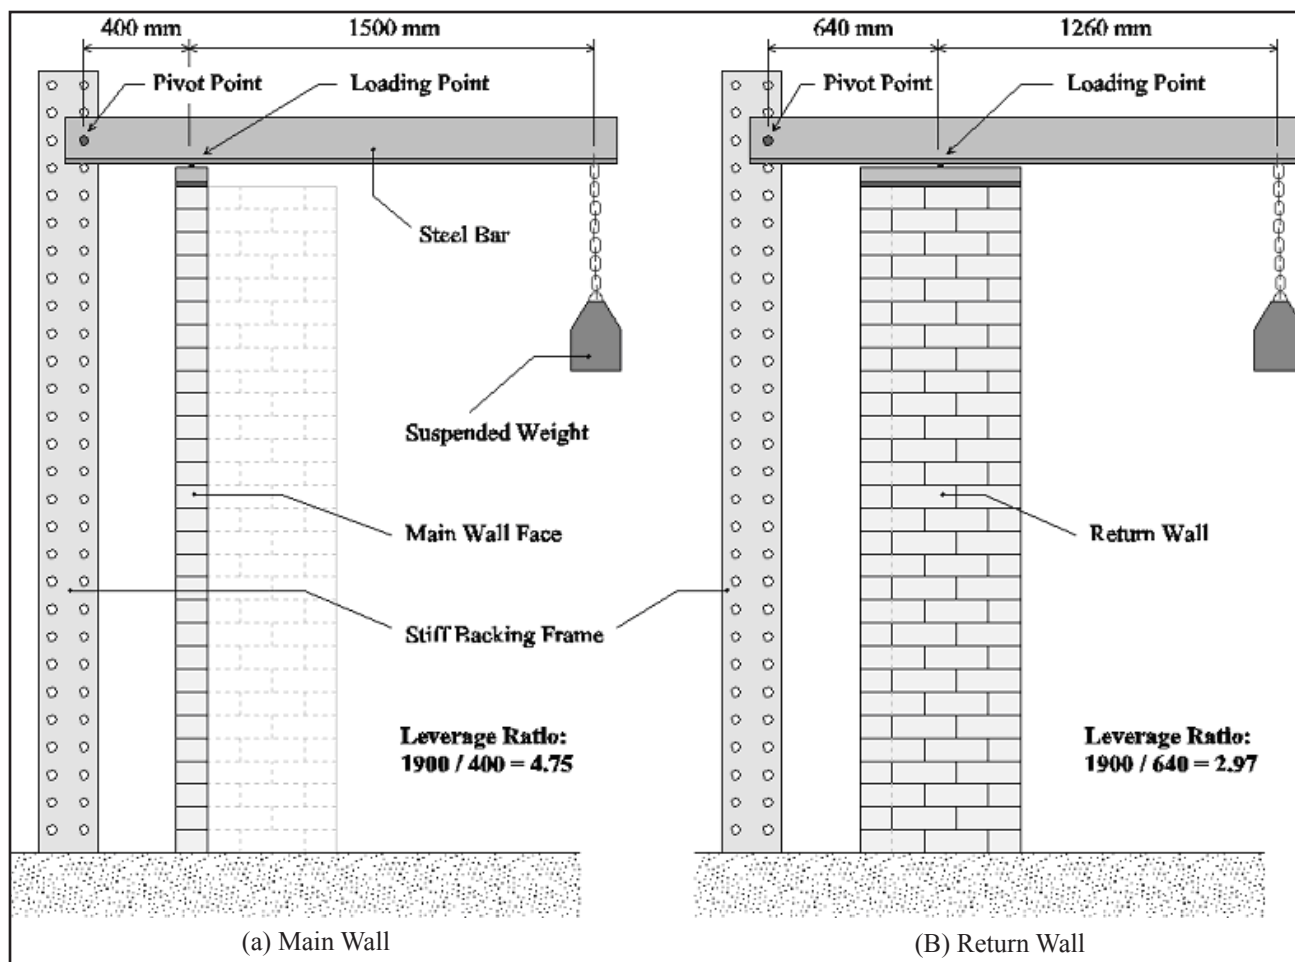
Vertical Pre-Compression Loading Scheme (25.4 mm = 1 in.)
